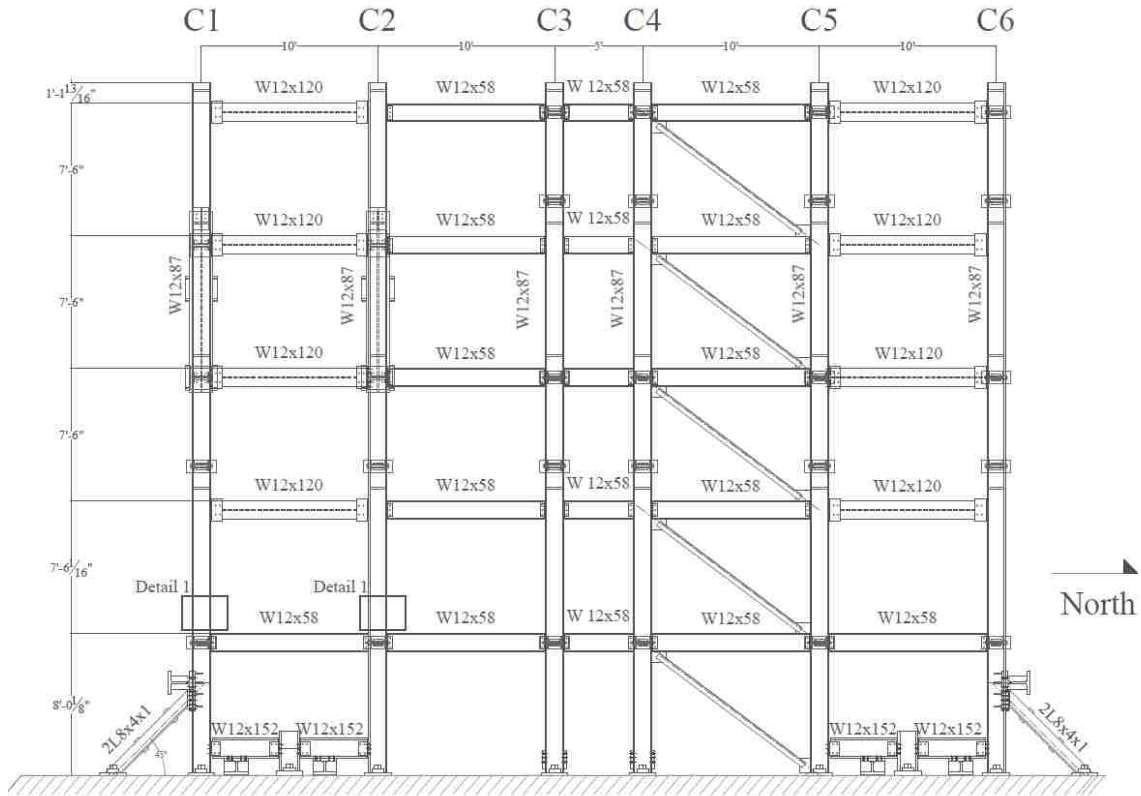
Elevation of Bracing Frame (Herrera 2005)
